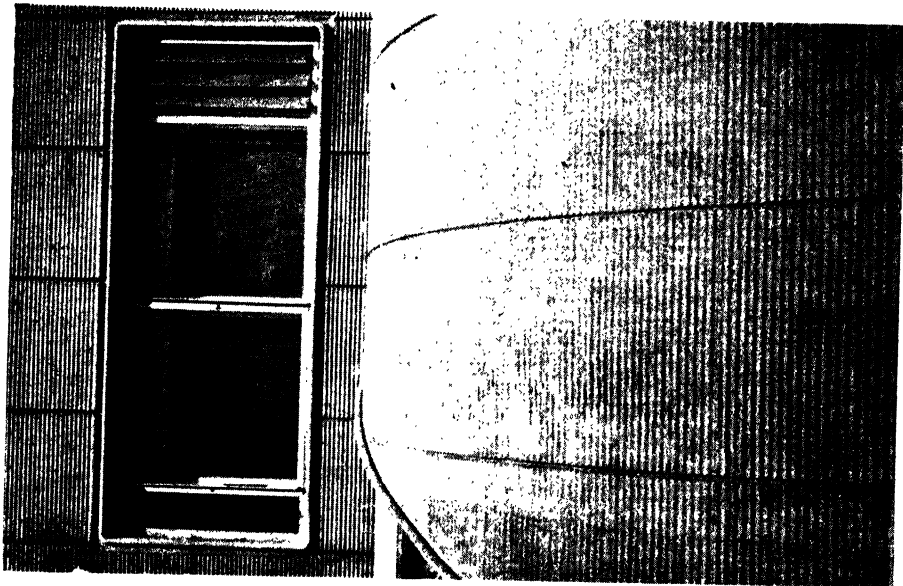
RIBBED CONCRETE SURFACE ON AN OFFICE BUILDING AT COPENHAGEN.
